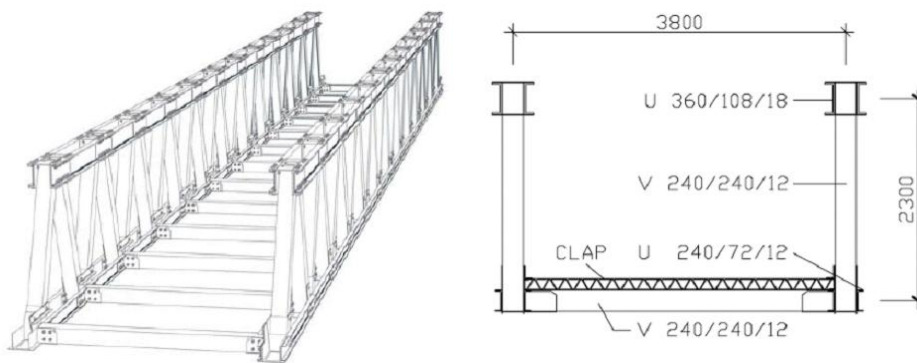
Isometric and cross sectional views of the GFRP-lightweight-emergency-bridge [8]
